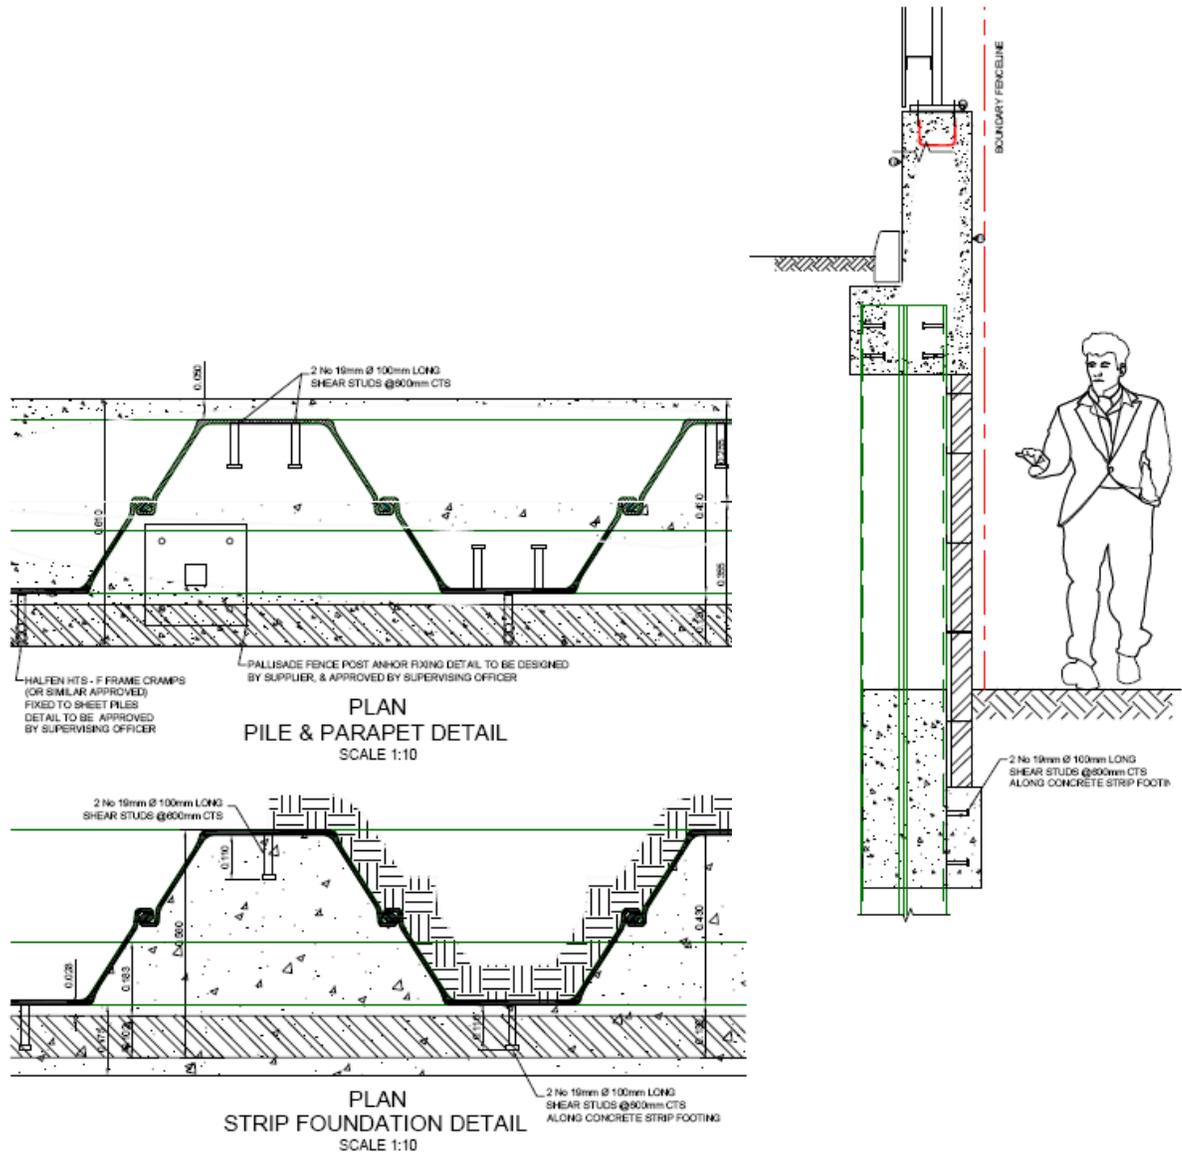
Example of original proposed sheet piled wall with brick cladding design
